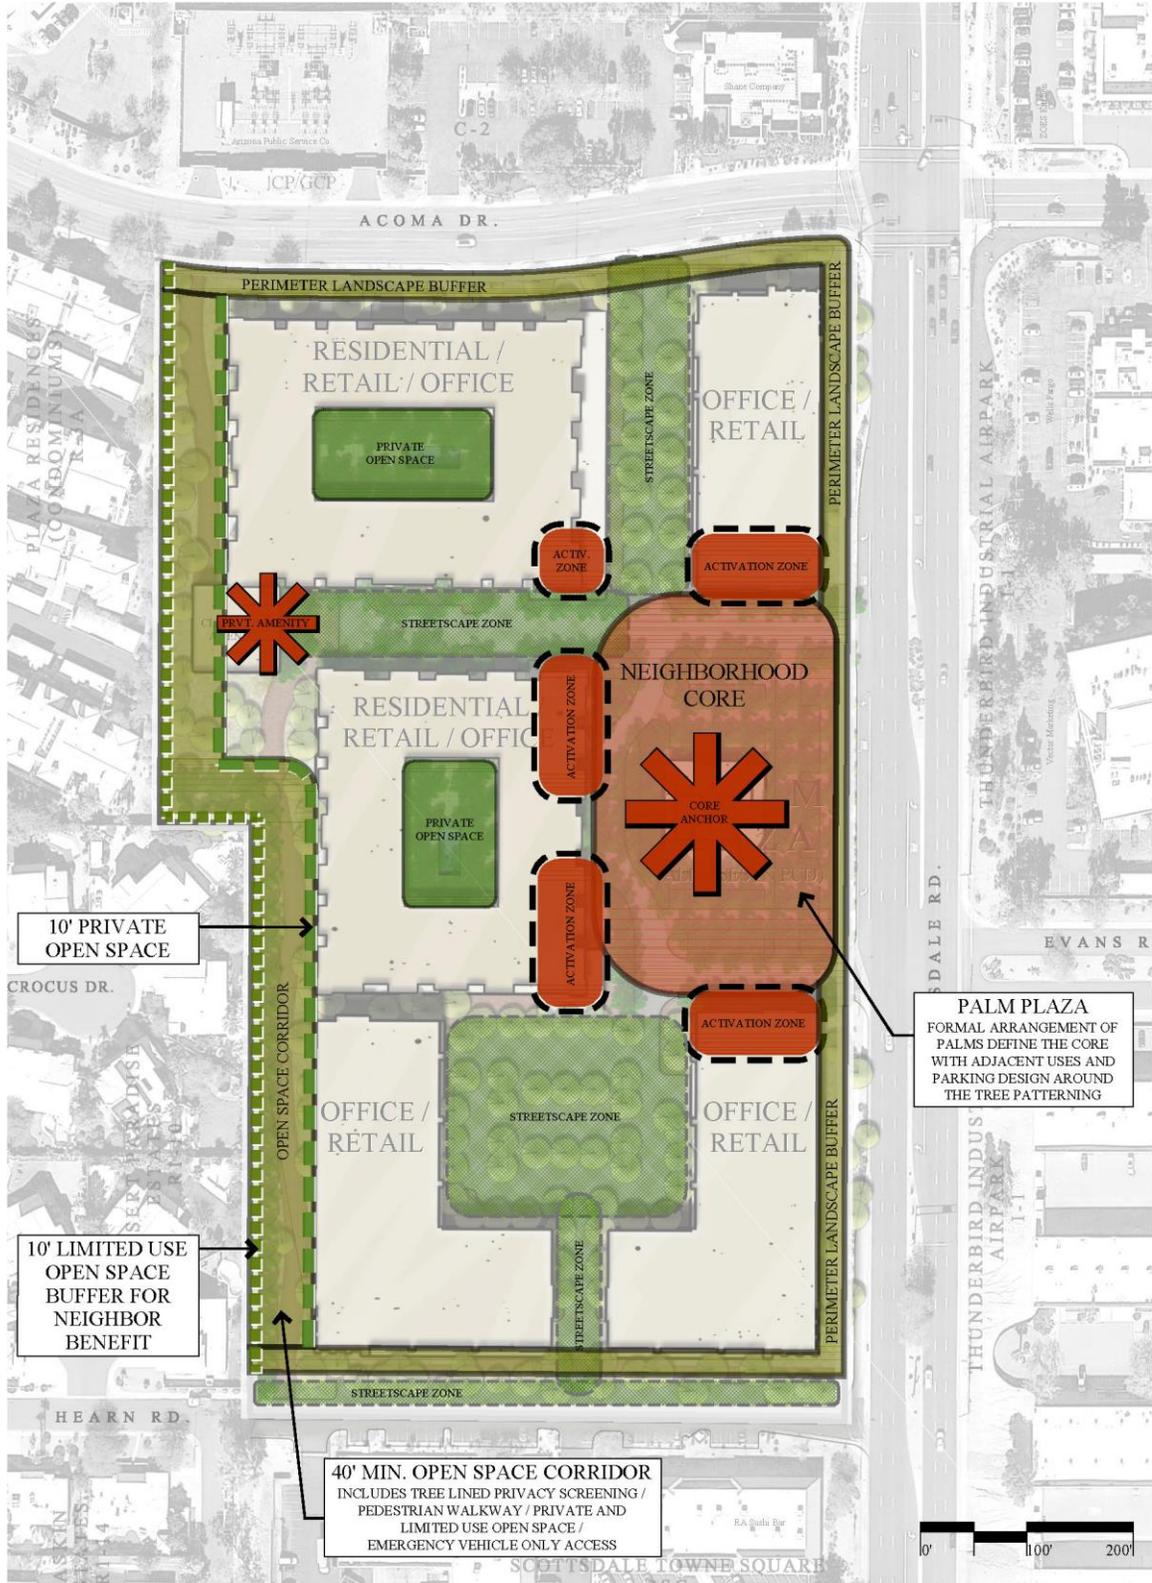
CONCEPTUAL SITE PLAN
